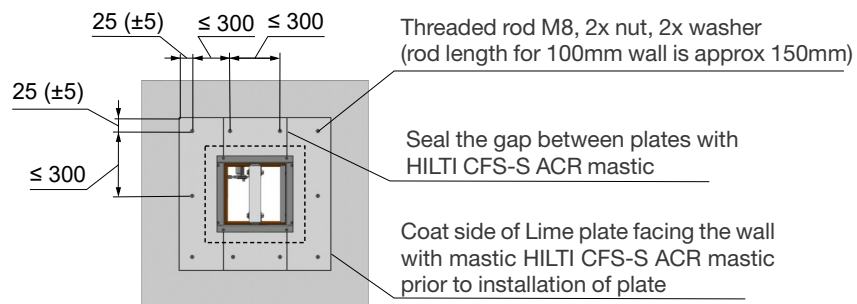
Outside solid wall construction - mineral wool, stuffing box, fire protection mastic and cement lime plate.
